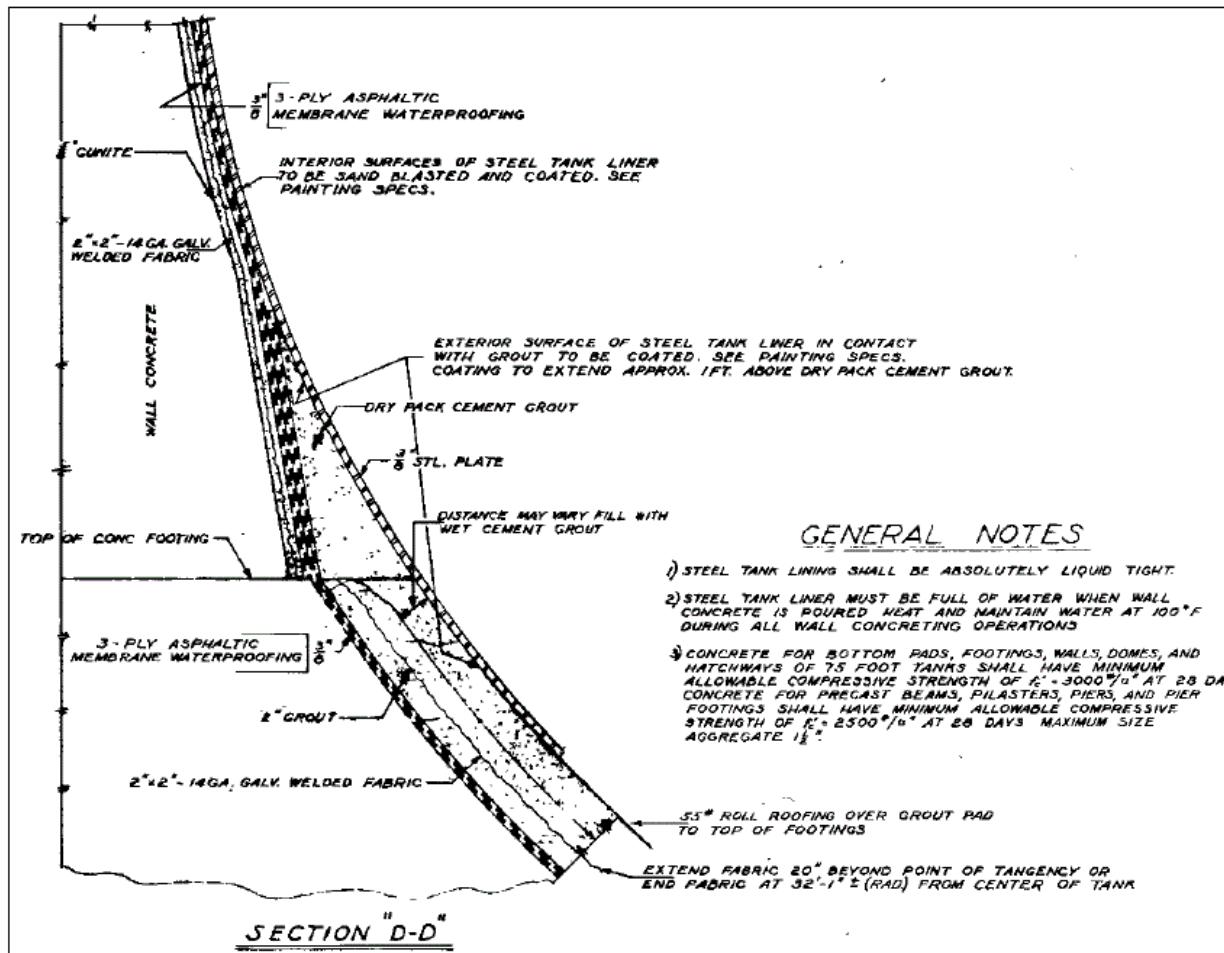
shows the detail of the knuckle liner to the 55-lb roll roofing, grout/fabric, and three-ply asphaltic waterproof membranes between the bottom and sidewall intersection (H-2-808 TY Farm 75-Foot Tank Sections, Section “D–D”). The three-ply asphaltic membrane waterproofing between the wall liner and the concrete shell continued the design from 241-BCTU Farms shown in Figure 3-3 which shows the rounded knuckle configuration and the bottom and sidewall three-ply water proofing. TX Farm used full penetration butt welds similar to 241-BCTU tank farms which are shown on BPF-73550.
